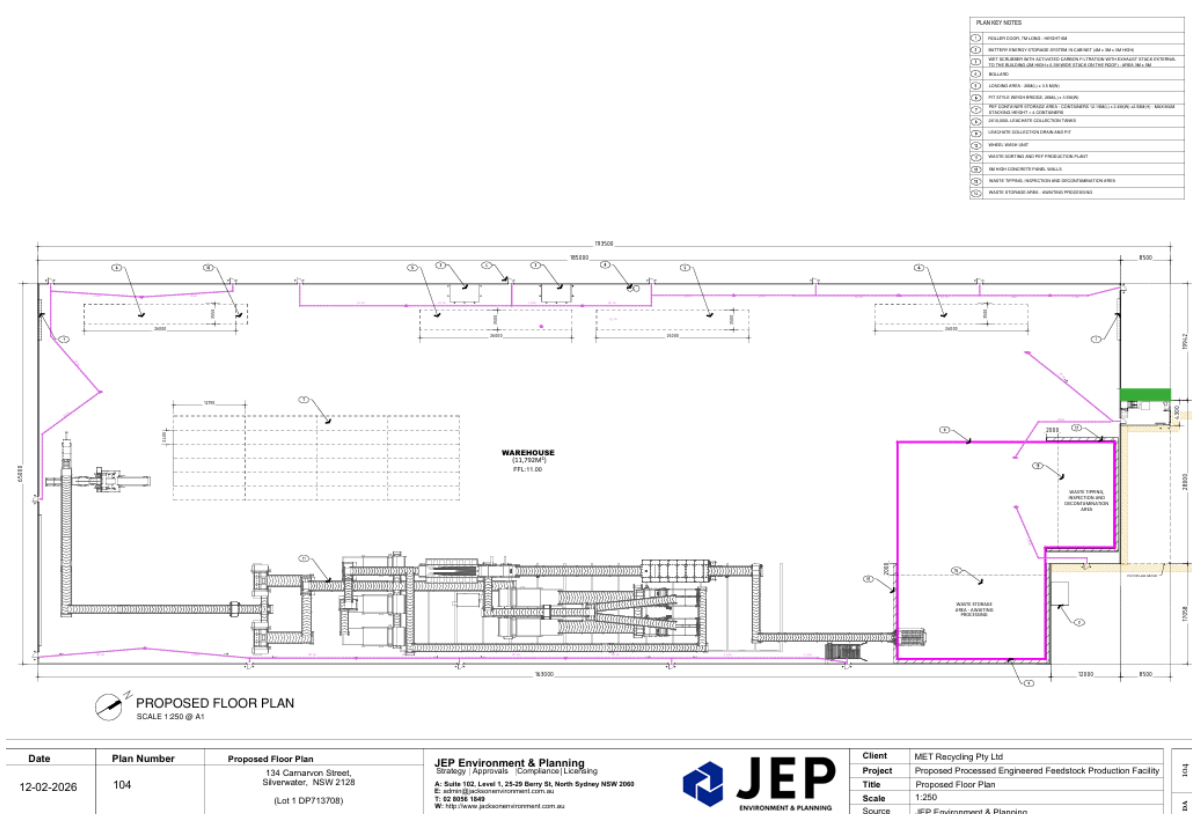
Proposed Floor Plan (Source: JEP Environment & Planning, dated 12 February 2026)
